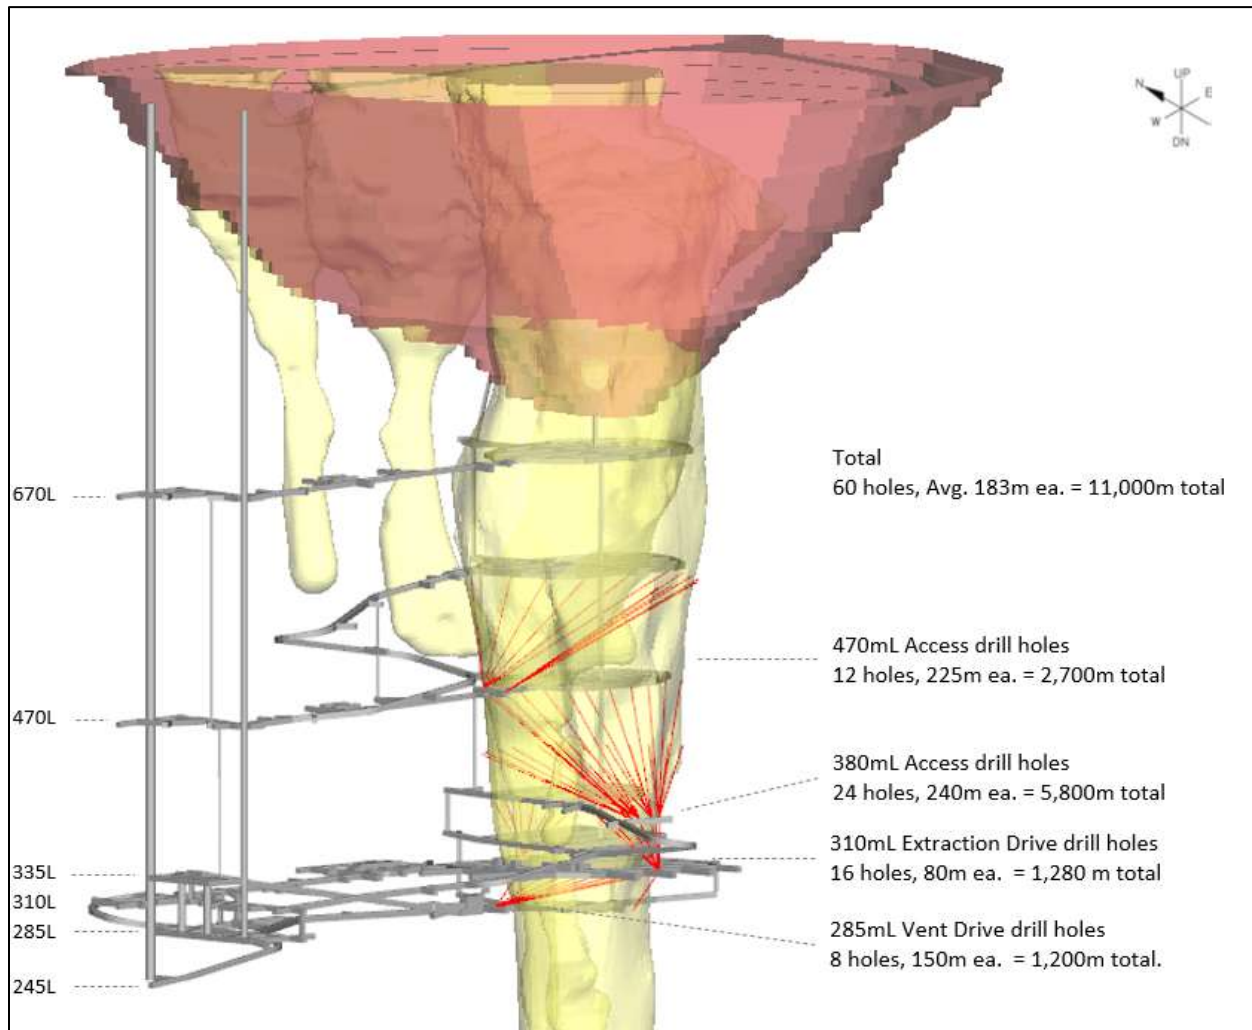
Section View of the UG Mine Layout along Section A-A'
